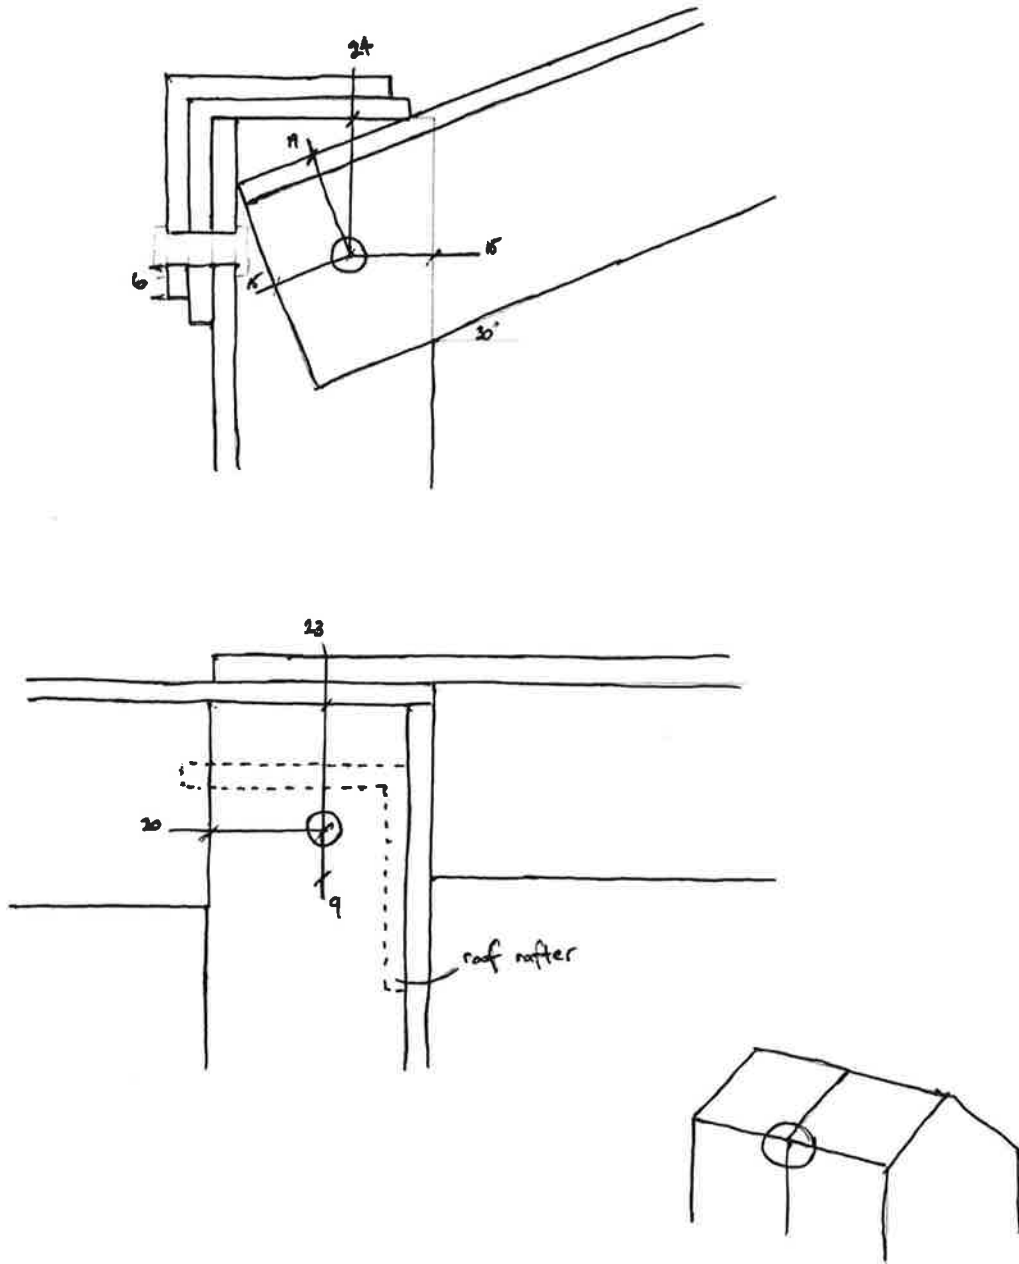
Side & Front Elevation Joint Layout Drawings for Central Joint
